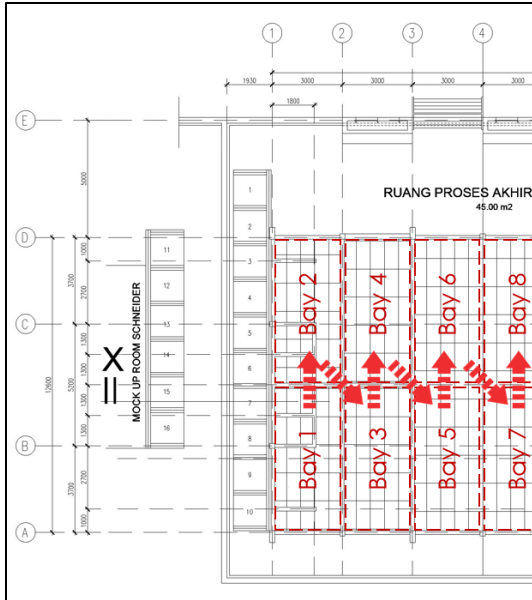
Part of ceiling plan of Block D showing inspection sequence for ceiling component.
